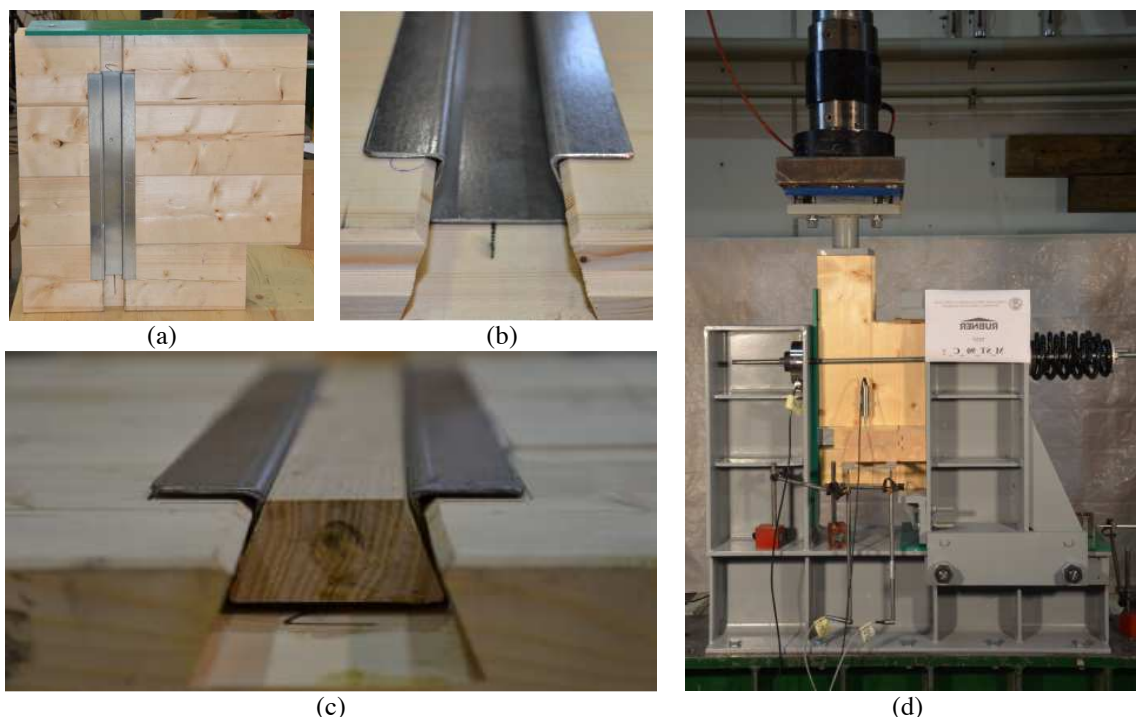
Reference experimental tests, with evidence of (a) typical small-scale specimen, (b)(c) steel dovetail reinforcements for S01 and S02 specimens, with (d) overview of the test setup [7, 8].
